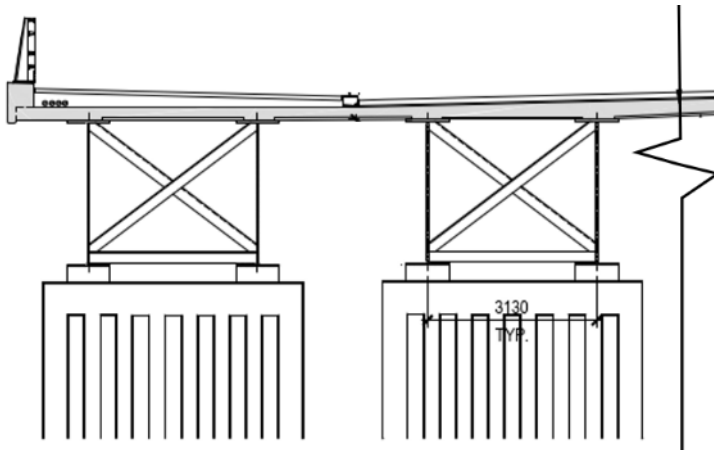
Half Cross Section of the Proposed River Finn Crossing (N14/N15 to A5 Link)
